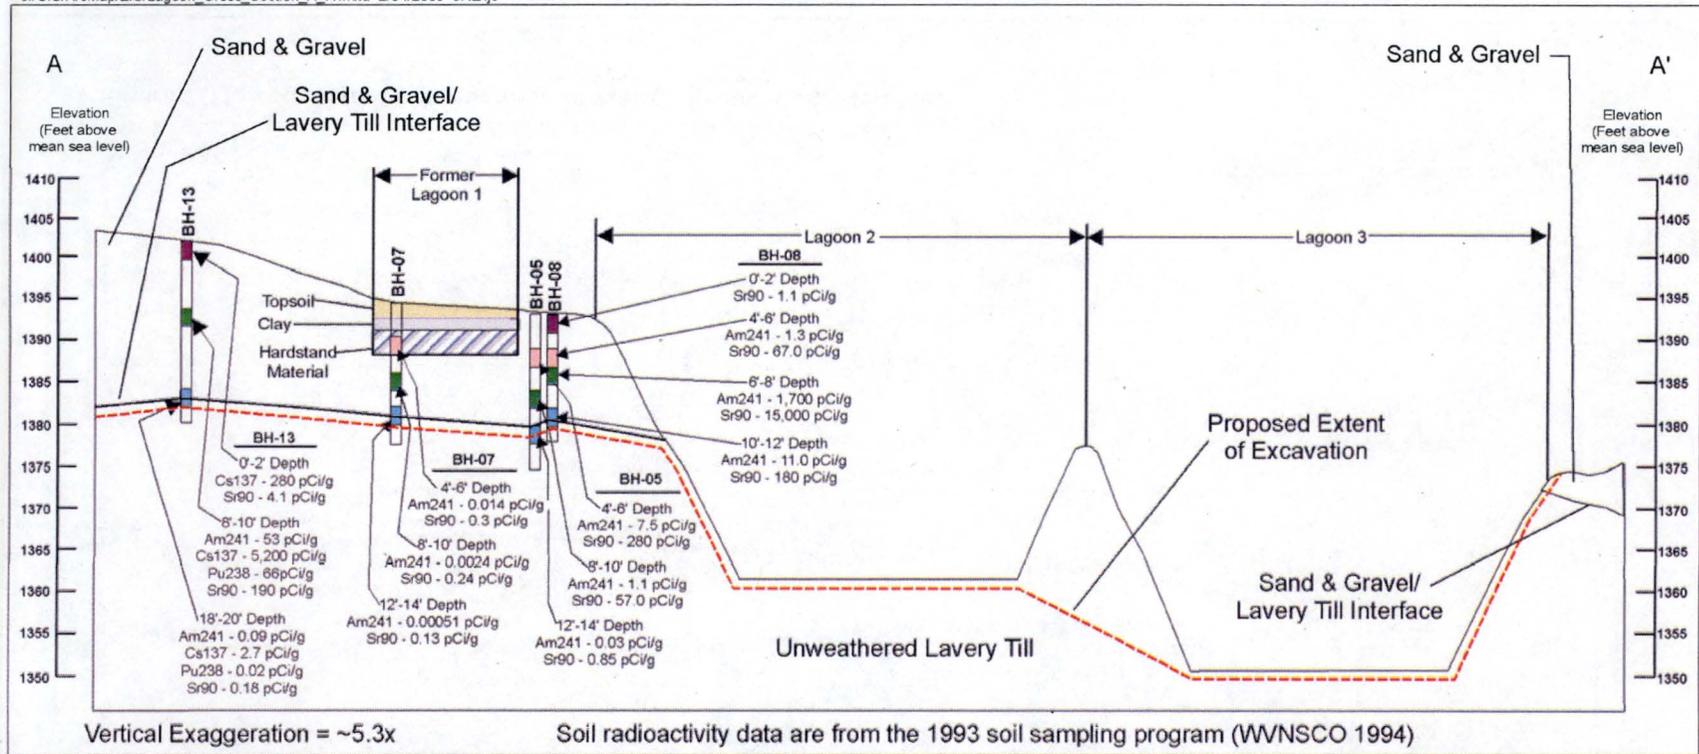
Conceptual Arrangement of WMA 2 Excavation, Cross Section
